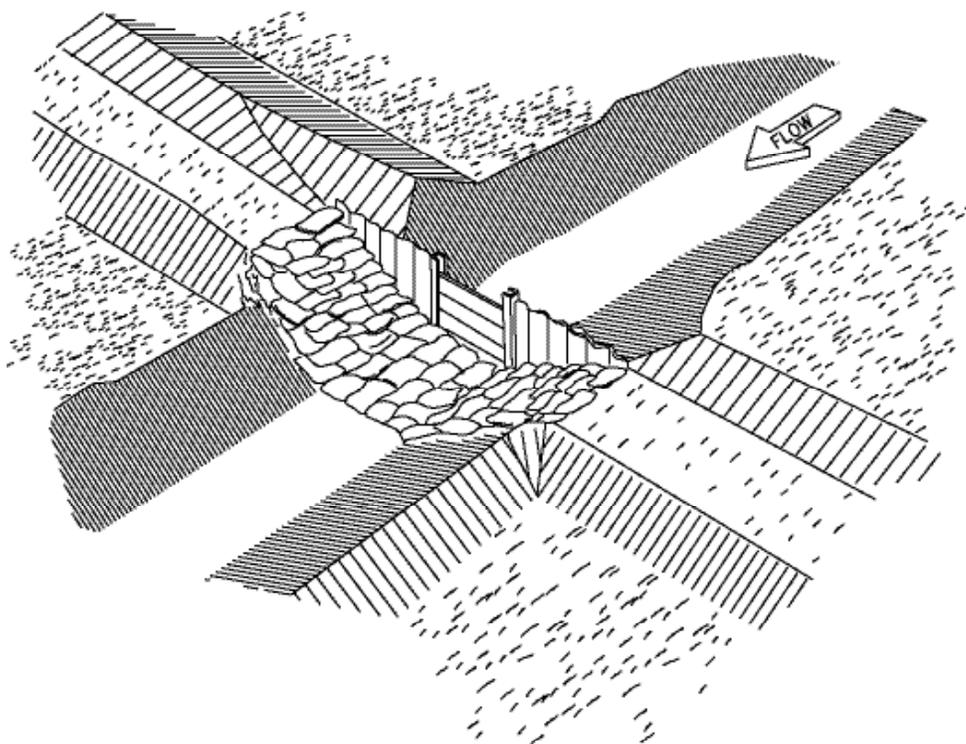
Sheet Piling Headwall with Sand -Cement Bag Sidewalls and Apron
